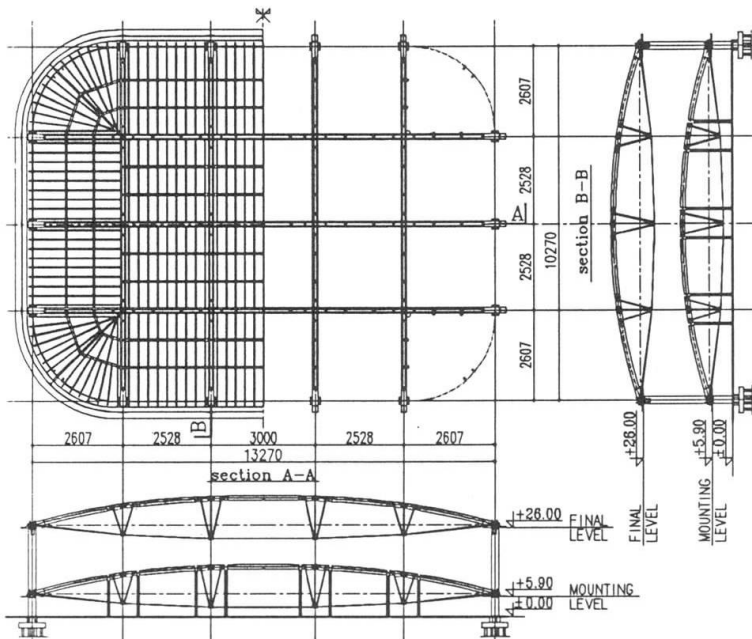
The roof structure with main roof girders on mounting level on temporary scaffolds and on final level, on the tops of the main columns
